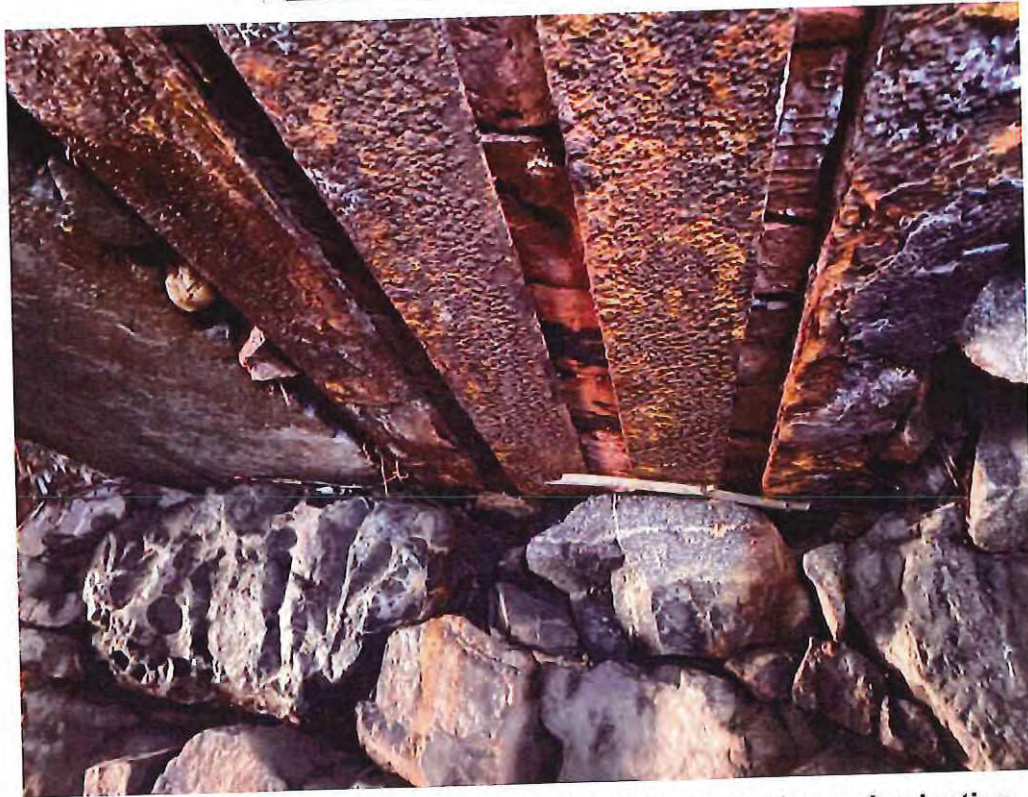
Span 1: 4 Steel beams with moderate rust and heavy lamination .
